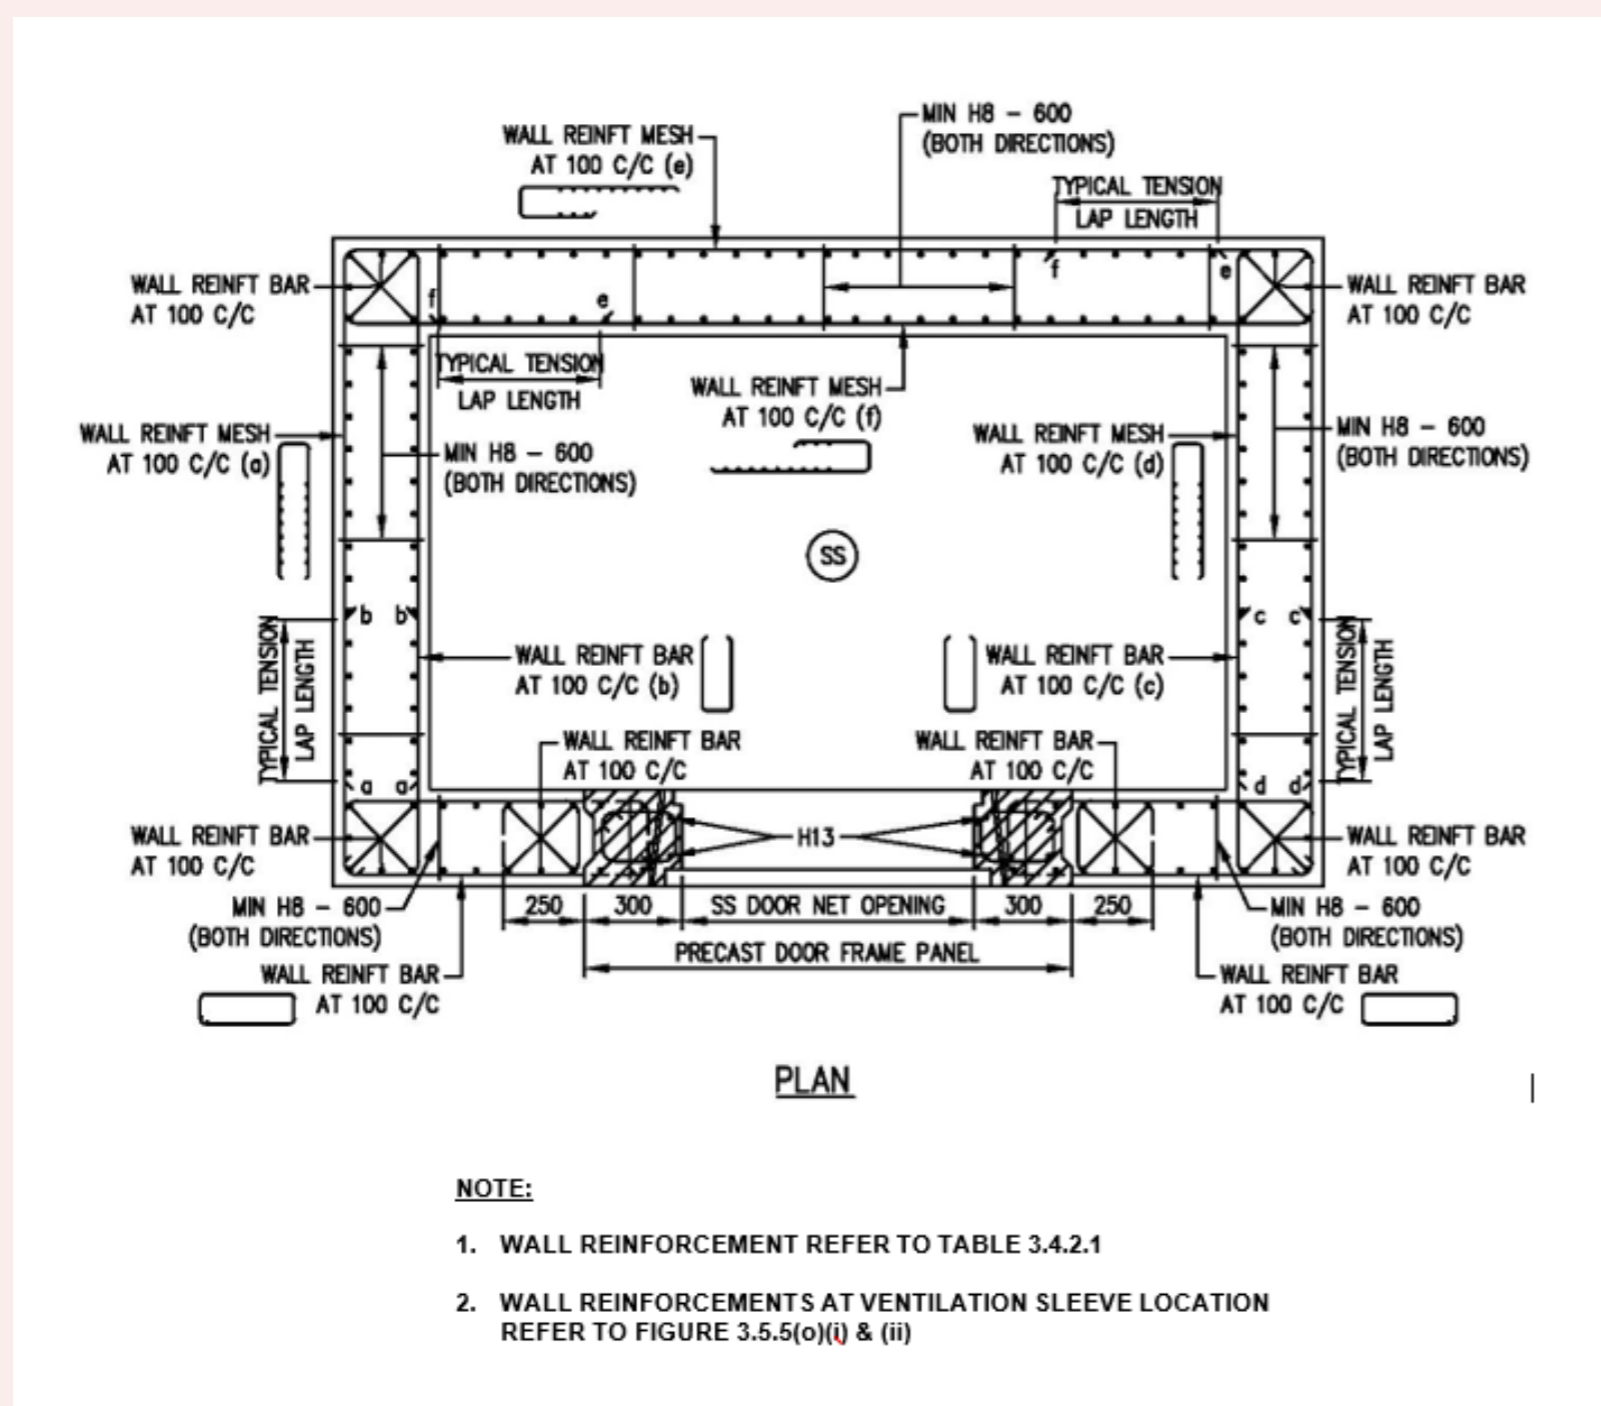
(c): CONCRETE WALL SEGMENT AT S/C SS DOORS AND BLAST HATCH
